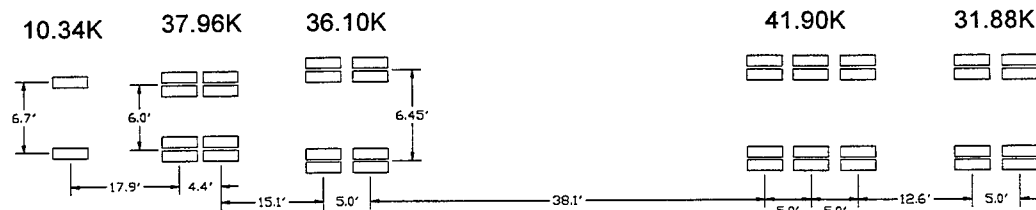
Load definition of permit vehicle 2 – R/C T-beam bridge.
